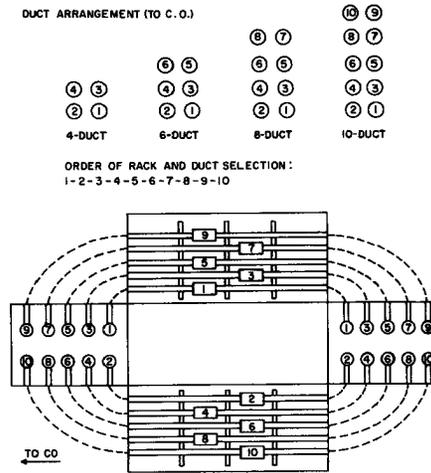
Type A Manhole—5-Foot Wide—10-Duct Capacity—2-Wide Configuration
